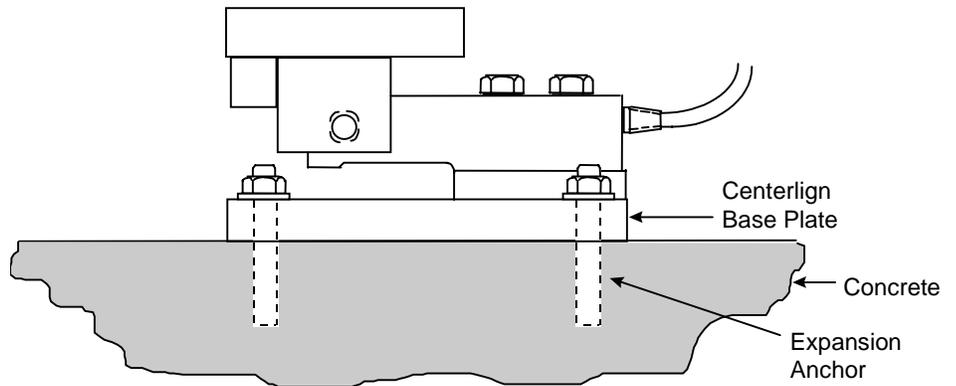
Base Plate Bolted to Level Concrete Floor
